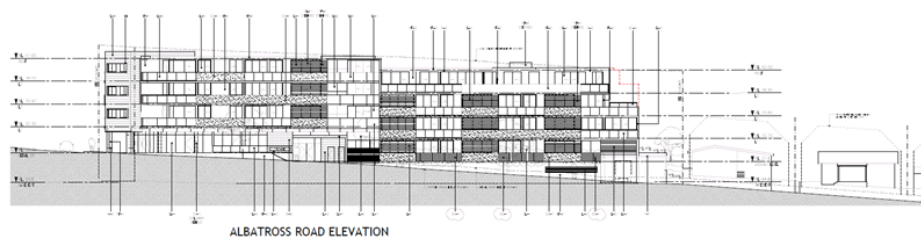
Elevation of the proposed development (western elevation – Albatross Road).
